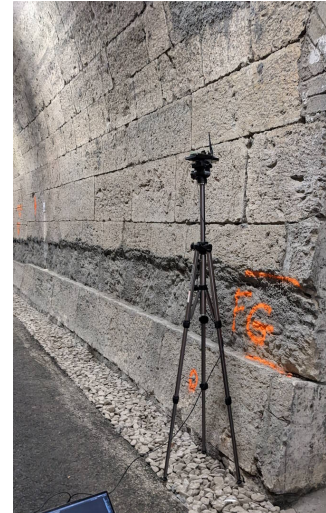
View inside the tunnel. On the wall the natural stones are shown, the tunnel ceiling is covered in sprayed concrete, and the floor is tarred.
